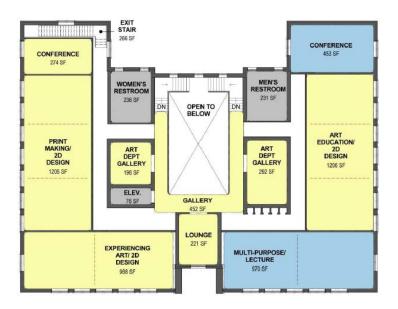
Proposed Floorplan: Second (Upper) Floor
